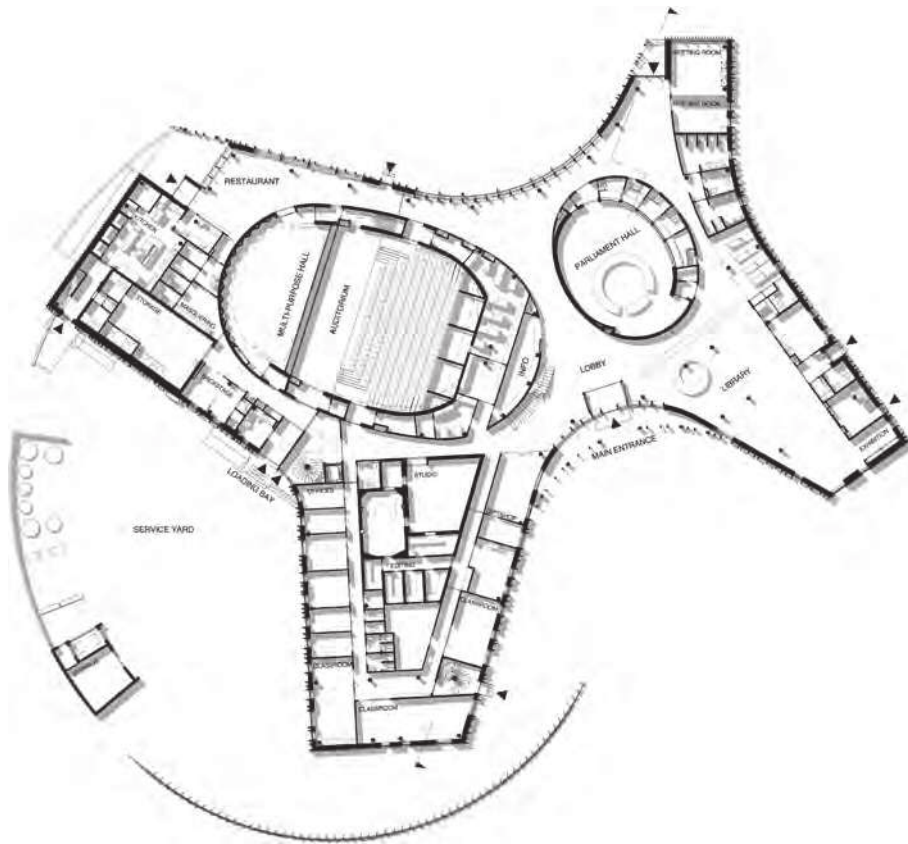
HALO Architects, Sajos, Inari, 2012. Ground floor plan, originally at 1:300 (drawing by HALO Architects, 2012). © Janne Laukka, Tuomas Niemelä and Milla Parkkali
